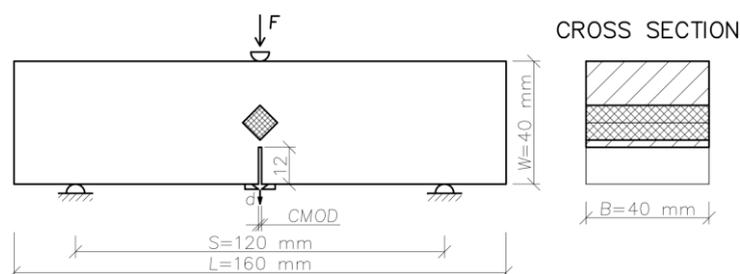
Specimen geometry and fracture test configuration (Vyhlídal et al., 2019).
